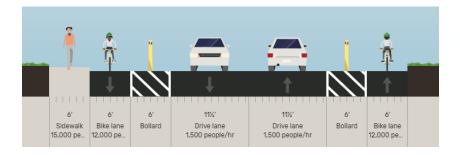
Proposed Cross Section on Kirkpatrick Street from Reed Street to Bentley Drive (Facing North)
